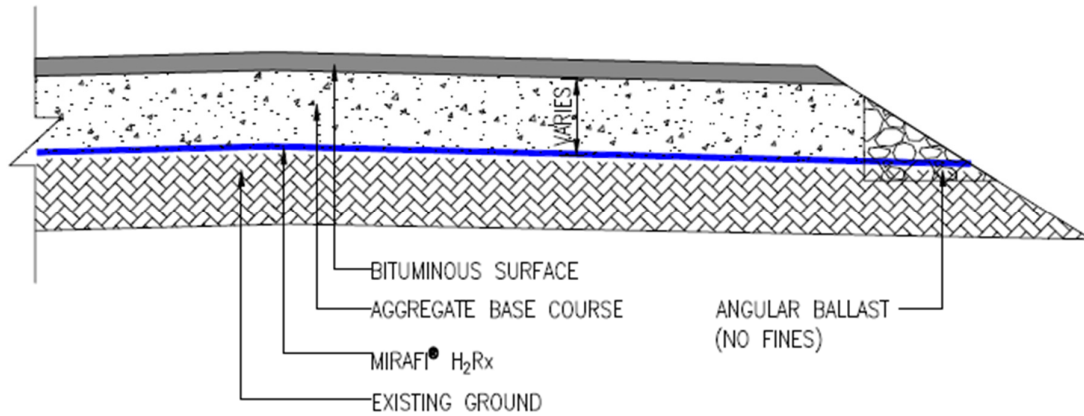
(a): A typical cross section diagram for geotextile edge terminated at side with angular ballast protection.
